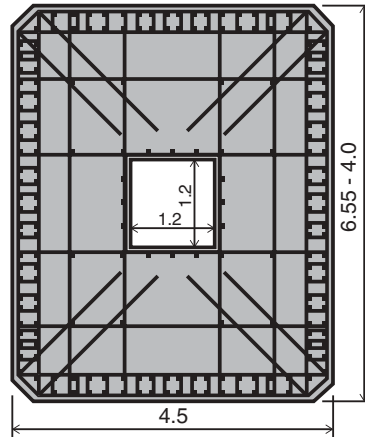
Cross section of the Lillebælt Bridge pylon
